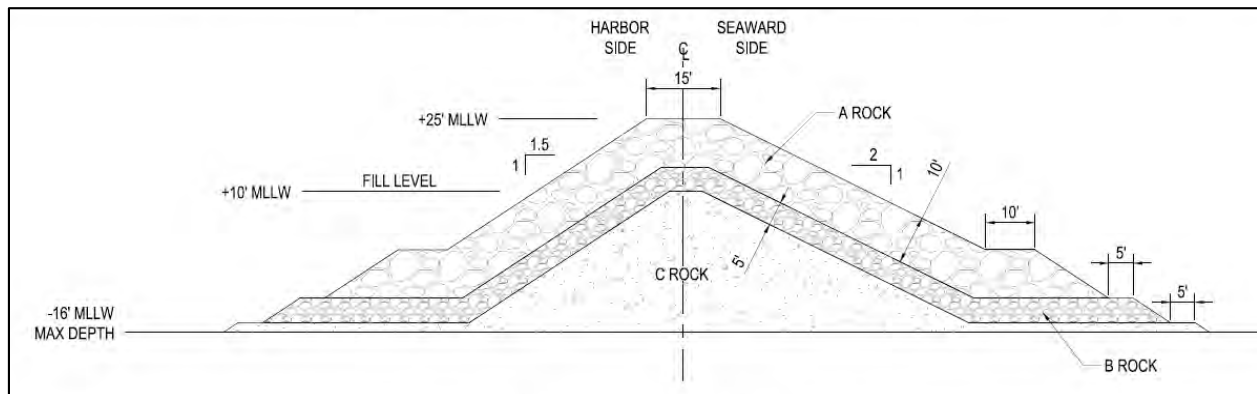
Typical Breakwater Cross Section for North Site Alternatives.
